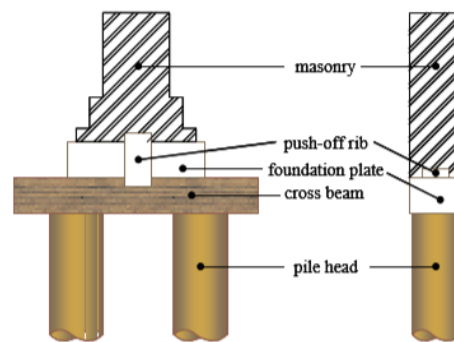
The Amsterdam foundation (left) and Rotterdam foundation (right) (Van der Stoel, 2001)
